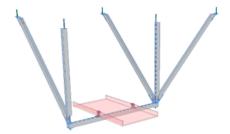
3-way rigid System (SeismicPro typical detail drawing, DWG. No. SP-DH6-C.1)
